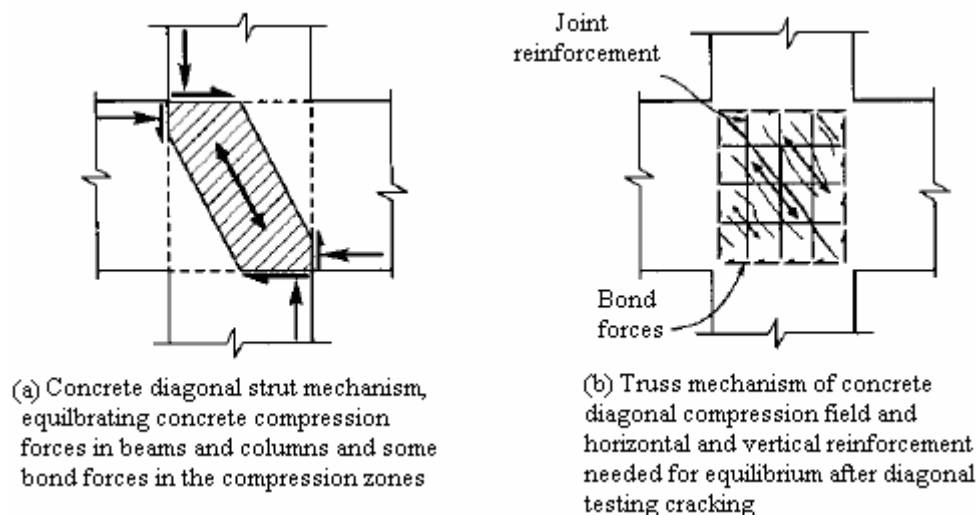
The resulting cracking and mechanism of force transfer assumed in New Zealand
